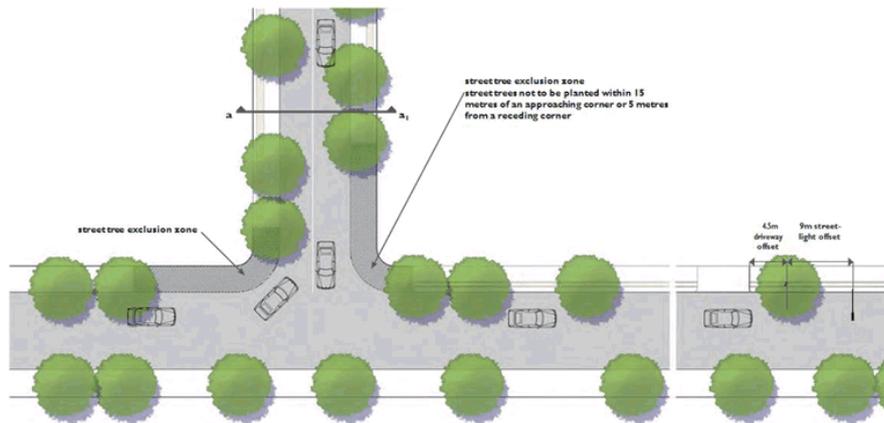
Street tree set out. Footpath tree planting for private works should be planted at 10 to 20 m centres. Variations to this may be made to accommodate driveways, avoid power poles etc. To ensure effective street lighting, plant trees not closer than 9 m to a street light. The trees should be set back from the rear of the kerb at a distance of 1 m. Where this distance is not achievable due to constraints such as underground services a minimum set back of 0.6 m may be used in conjunction with the installation of root barrier. At intersections, all trees should be planted at a minimum 15 m back from the face of the kerb of the adjoining street. Minimum distances are to be agreed by Council, based on road layout and design speed.
